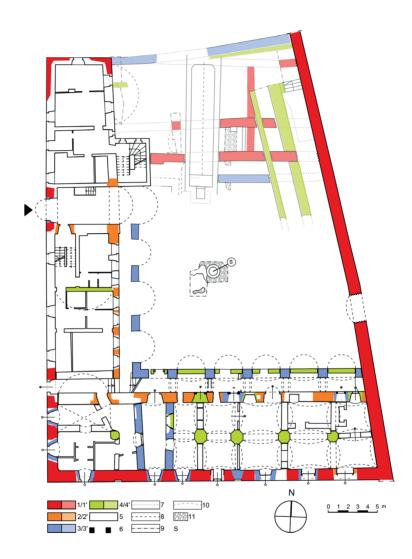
Głuchołazy, the alderman's seat, ground floor plan with chronological stratification of the walls. Key: 1/1' – first half of the 14<sup>th</sup> century (basement and ground floor walls), 2/2' – around the middle of the 15<sup>th</sup> century (basement and ground floor walls), 3/3' – around 1603 (basement and ground floor walls), 4/4' – the second half of the 17<sup>th</sup> century (basement and ground floor walls), 5/5' – 19<sup>th</sup> and 20<sup>th</sup> century, and also unrecognized walls, 6/6' – stone frames, 7/7' – reconstruction lines (walls and vaults (hypothetical), 8/8' – existing vaults and arches, 9/9' – borders of inspection excavations, 10/10' – reconstruction lines of gothic vaults, 11/11' – stone pavement, S – well (developed by A. Legendziewicz, E. Grodzka, D. Dobrasiak)
